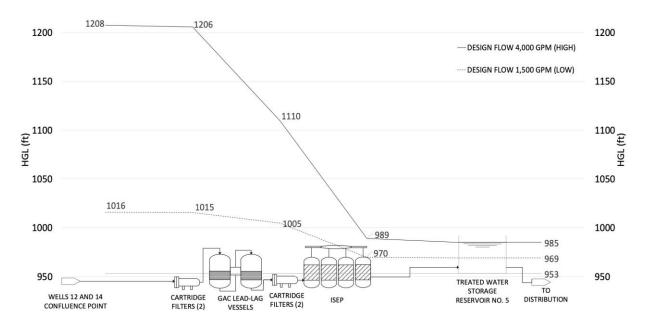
HYDRAULIC PROFILE OF THE PROPOSED SYSTEM
